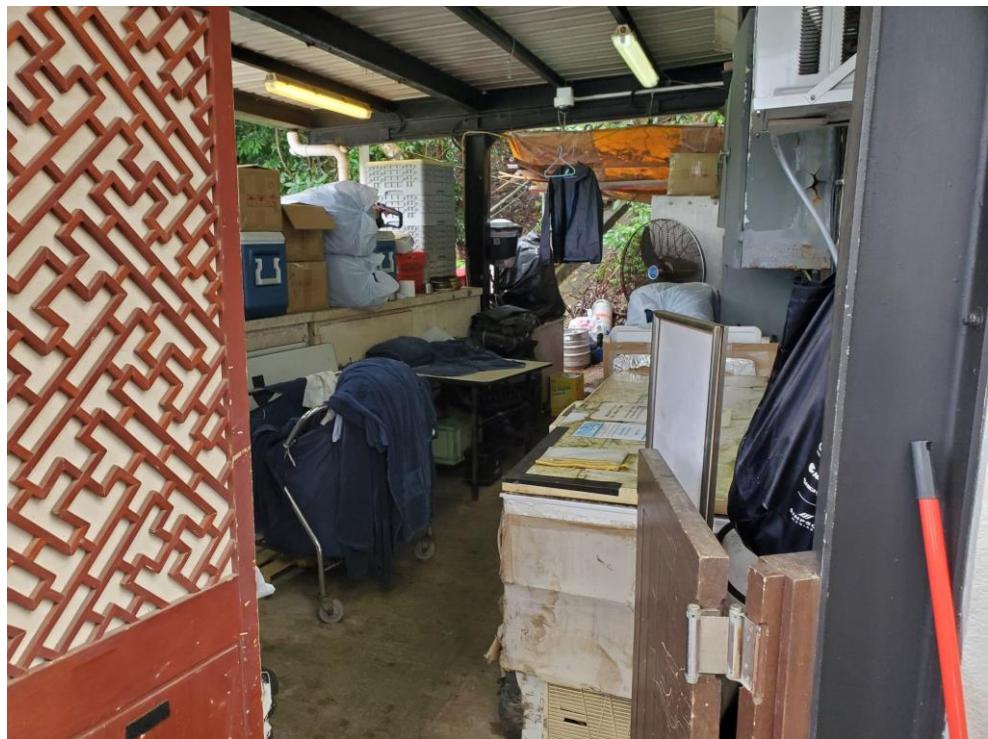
Existing situation outside of the kitchen, where freezers and other ancillary facilities are located.
